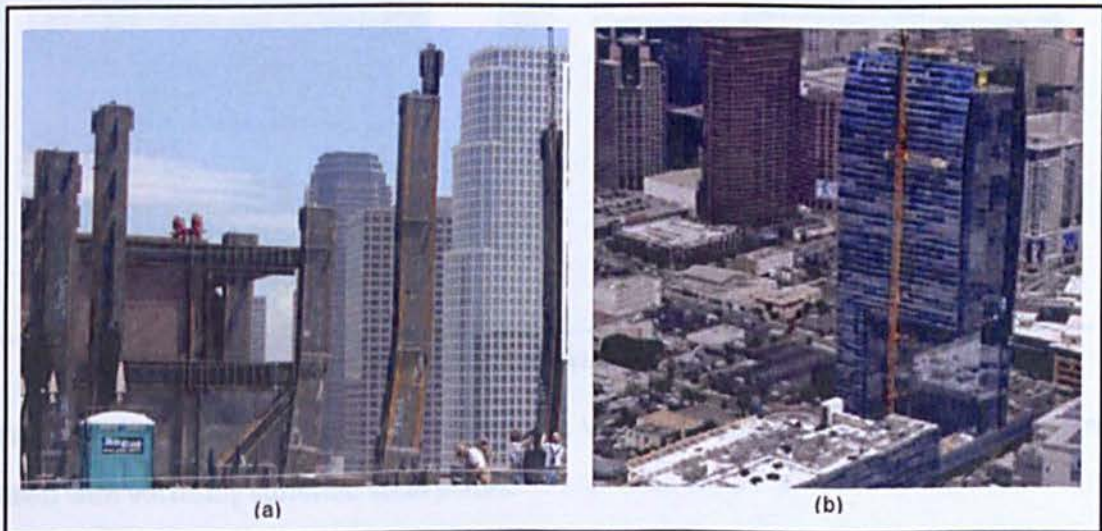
(a) Steel plate shear walls under construction (b) Elevation view of 56-storey L.A. Live hotel and residence building (Photo courtesy of AEG and Gensler)
